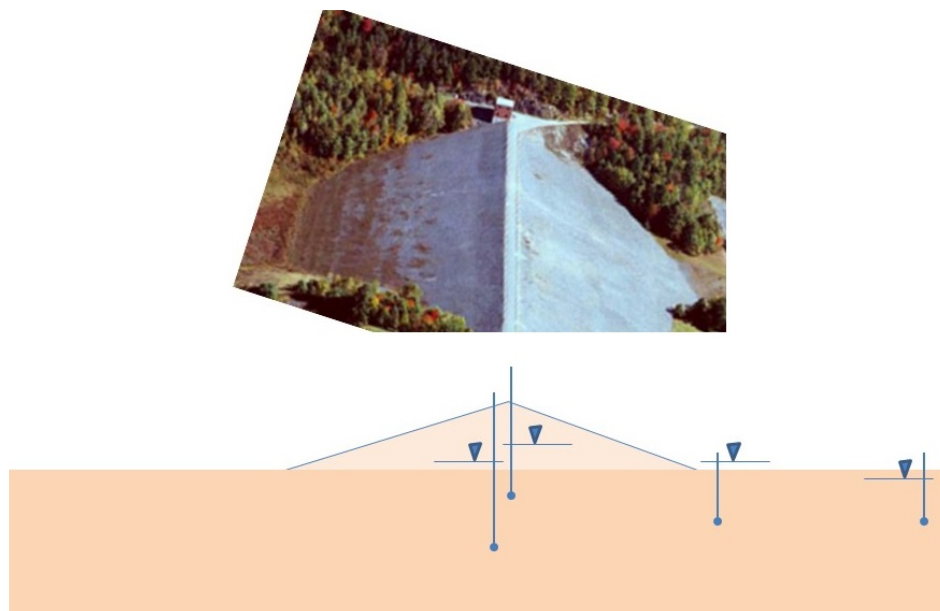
Illustration showing a photo of a dam and cross section with piezometer locations
